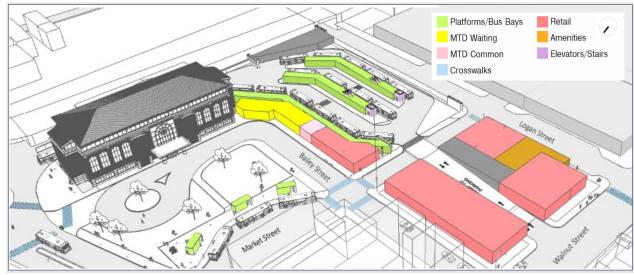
Site Layout for First Floor of Illinois Terminal Expansion
